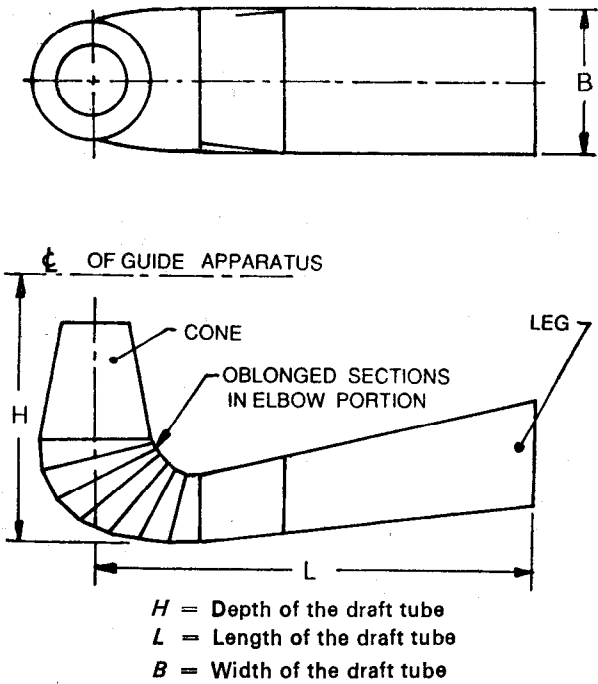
DRAFT TUBE DESIGN TYPE 2 ( FOR HEADS ABOVE 200-250 m )
